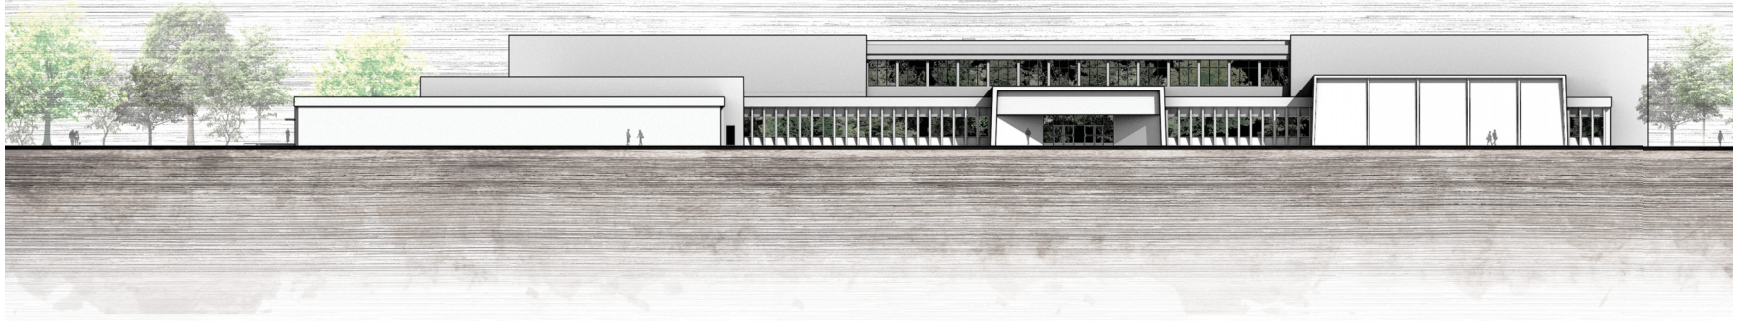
1:700 Existing South Elevations of the Royal Alberta Museum
